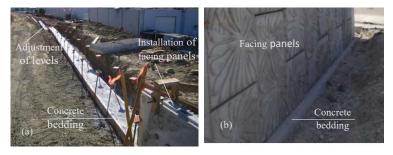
(a) Concrete bedding preparation. (b) Facing panels installed on concrete bedding.
